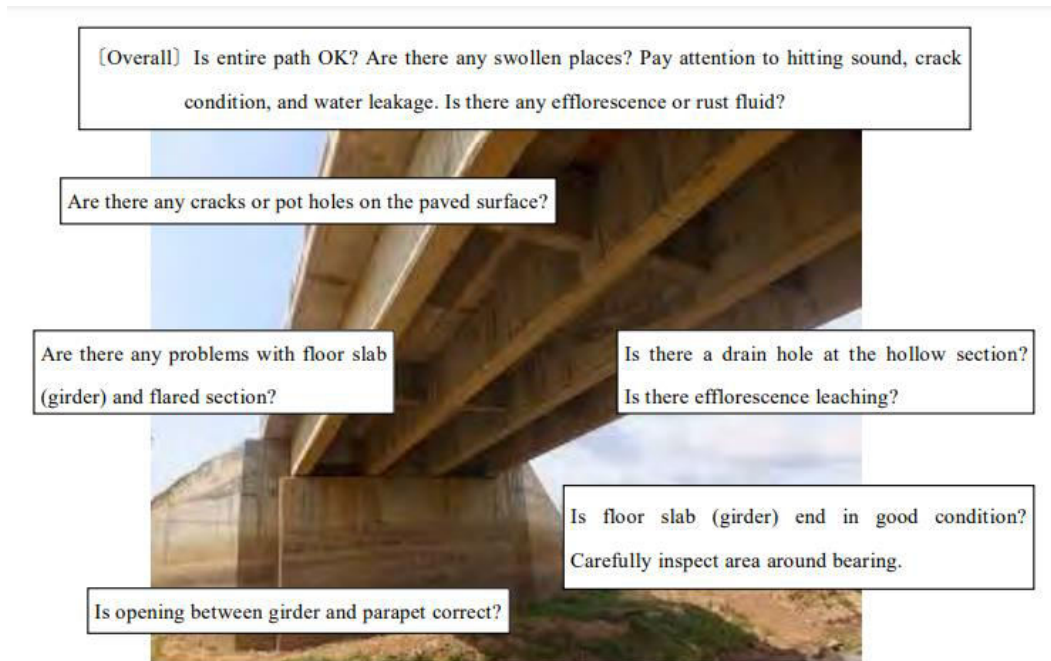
The general inspection sections of the concrete bridge [75].
